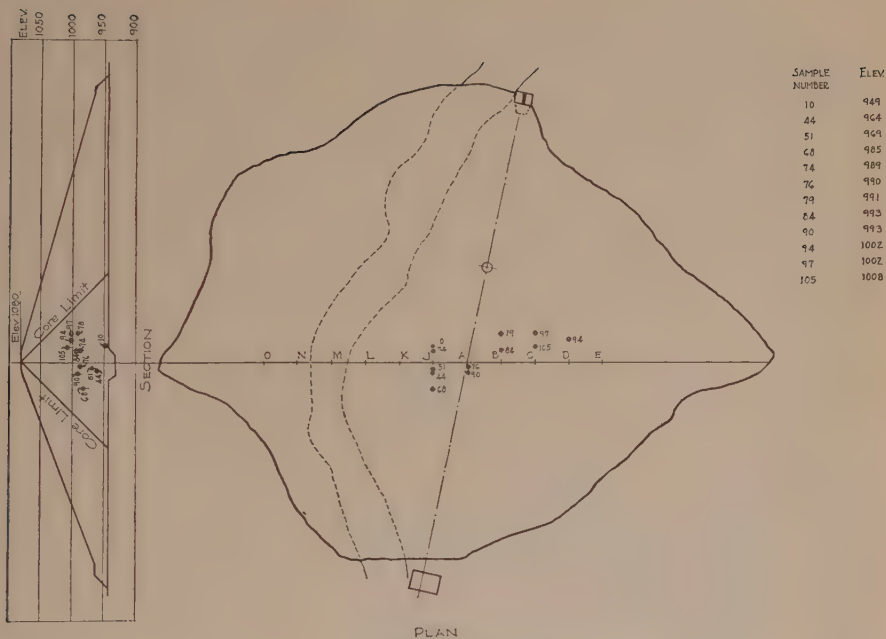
SWINGING BRIDGE DEVELOPMENT — PLAN SHOWING LOCATION OF CORE SAMPLES
